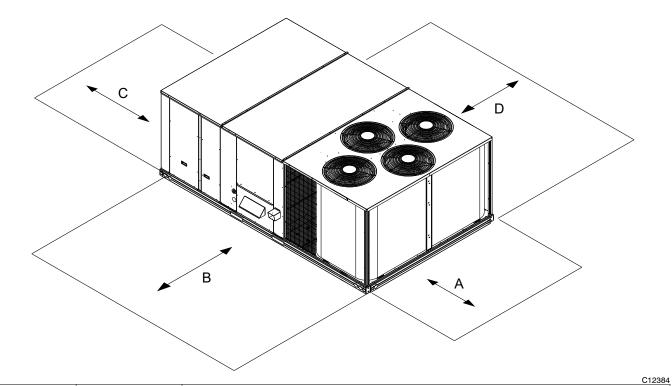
(cont.) - Unit Dimensional Drawing – 24 and 26 Size Units, Sheet 3 of 3
